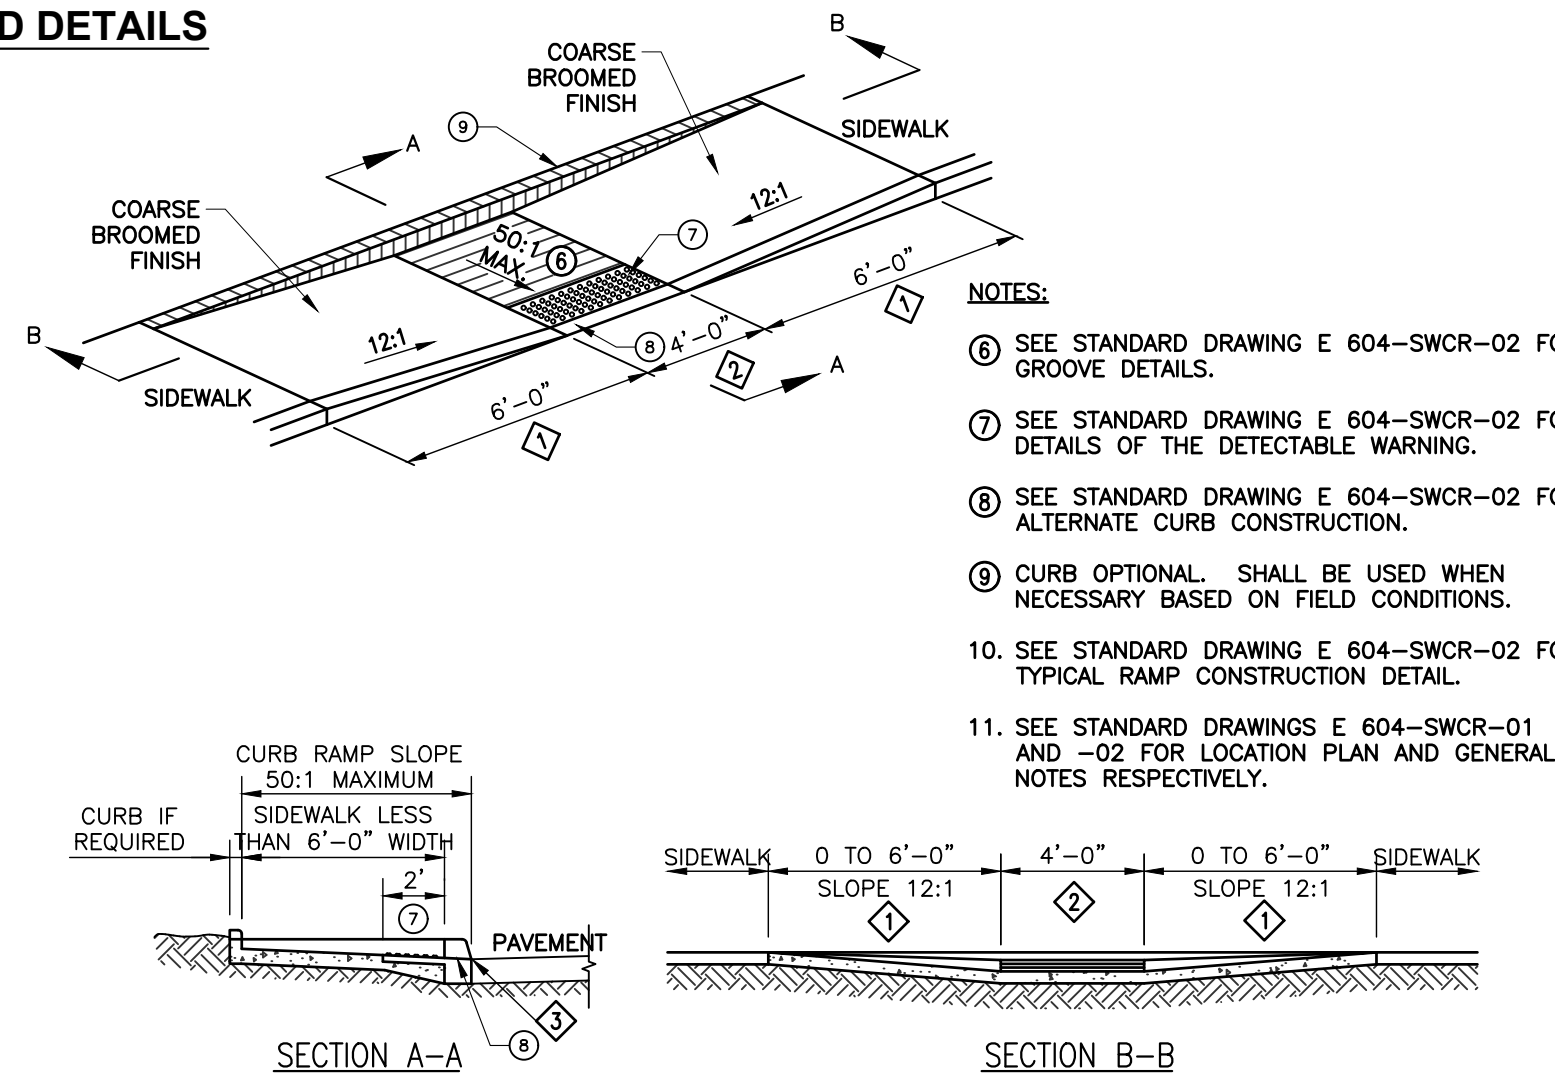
SIDEWALK CURB RAMPS GENERAL NOTES AND DETAILS
